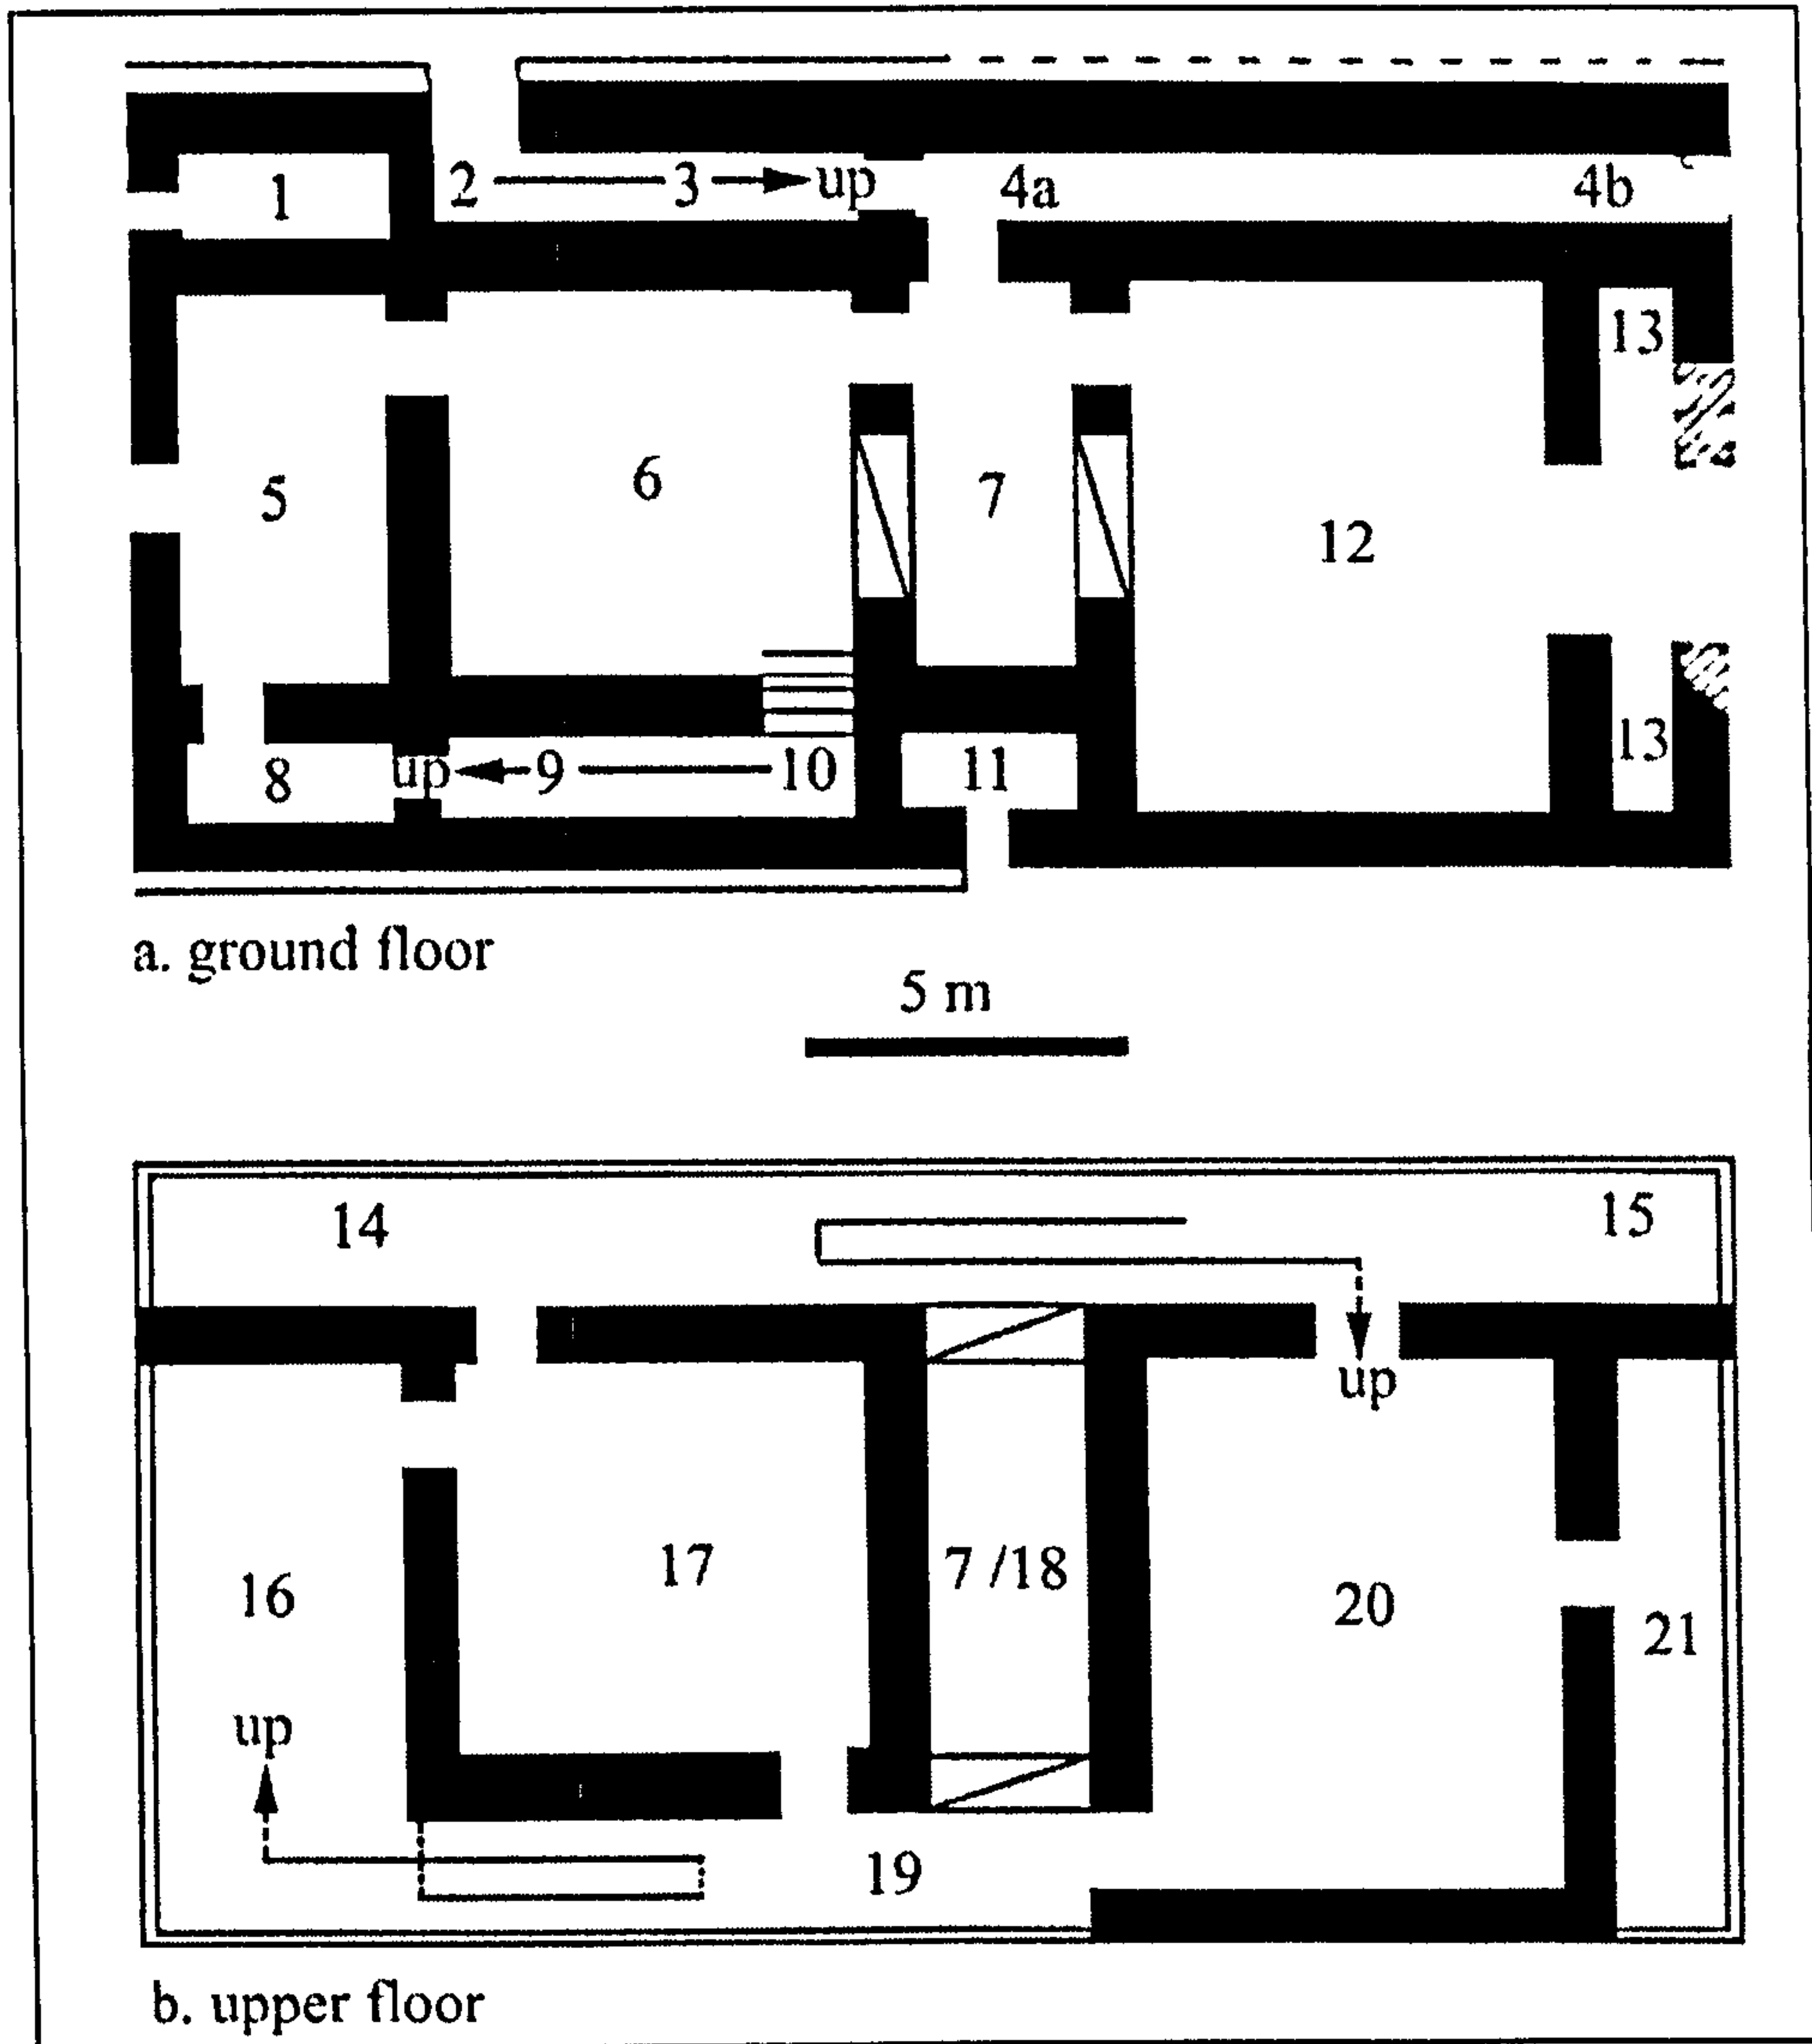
Lerna, House of the Tiles: Plan of ground floor and upper storey (adapted from Shaw 1987: Fig. 3a,b).
